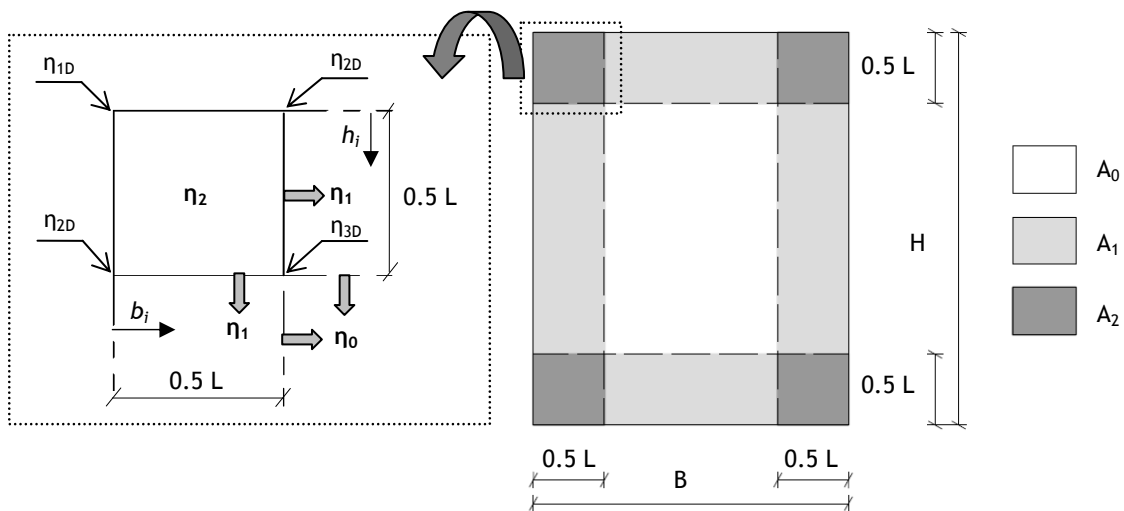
A cross-section divided in three zones (with detail of the corner).
